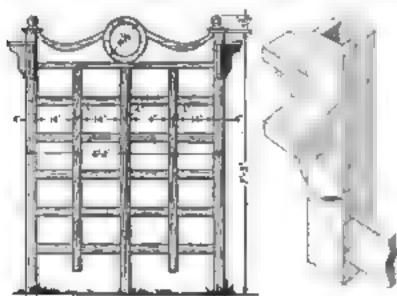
An exchitectural trellis used against a house wall, and detail, explaining construction, of the pests
